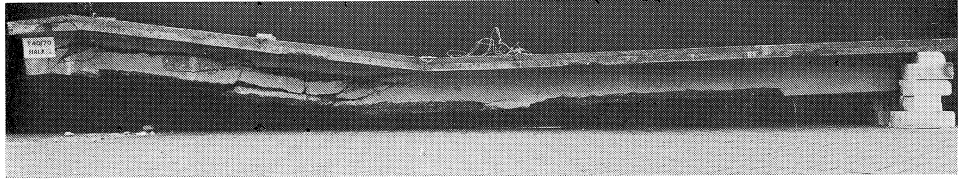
Test beam 2 failed as a result of slip of prestressing strands.
